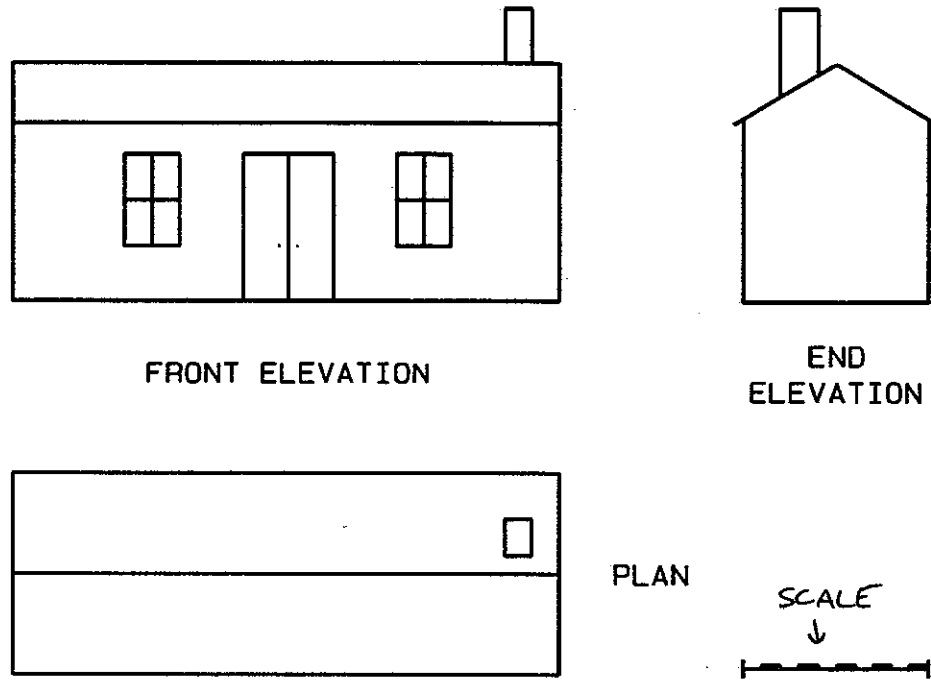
Orthographic projections in the form of plan, elevation, and side elevation.
